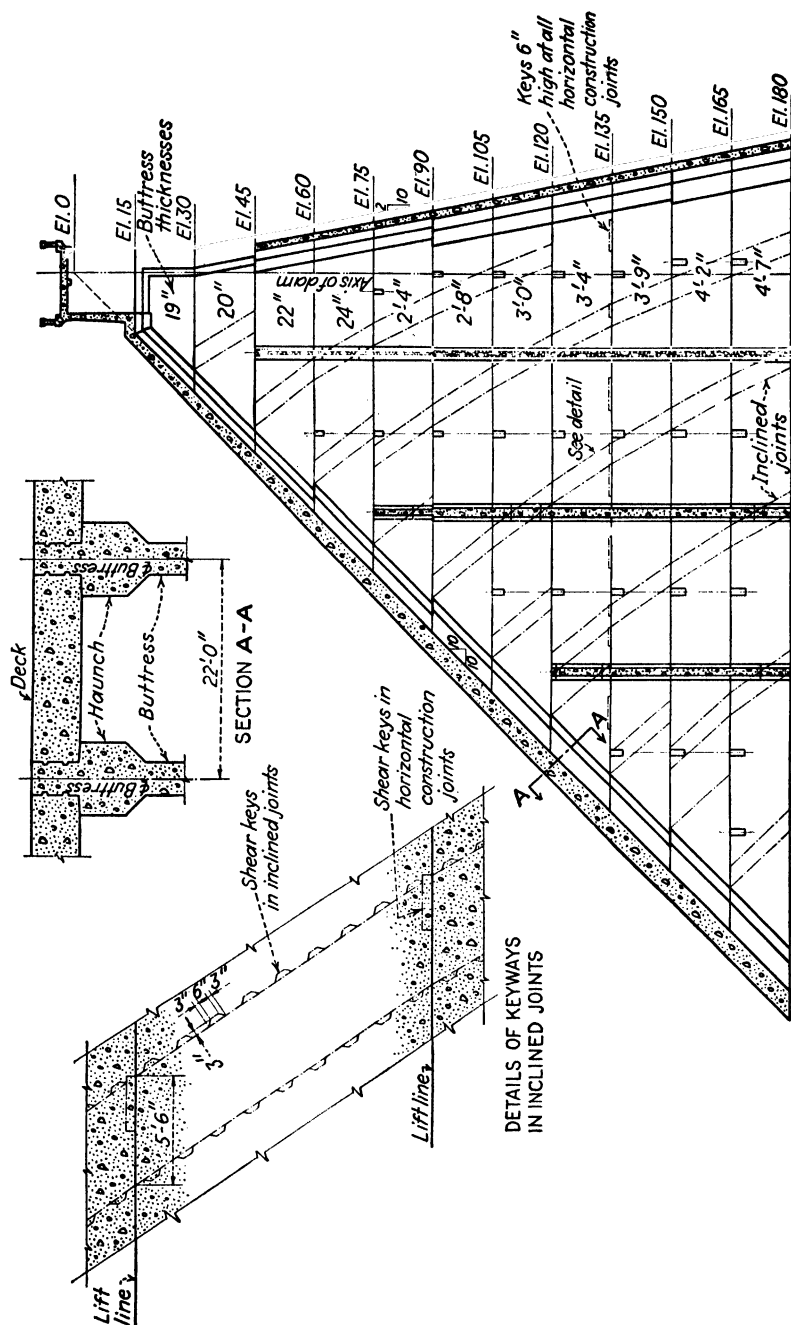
Rodriguez Dam. Buttress elevation and sections (inclined joints).
